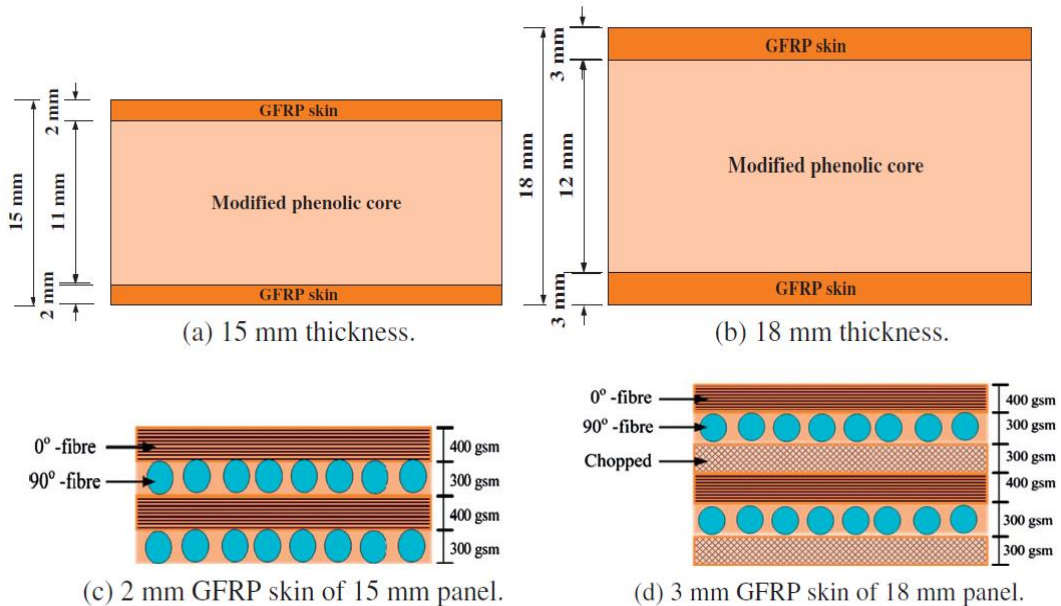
New GFRP sandwich panel cross sections (Awad et al. 2013)
